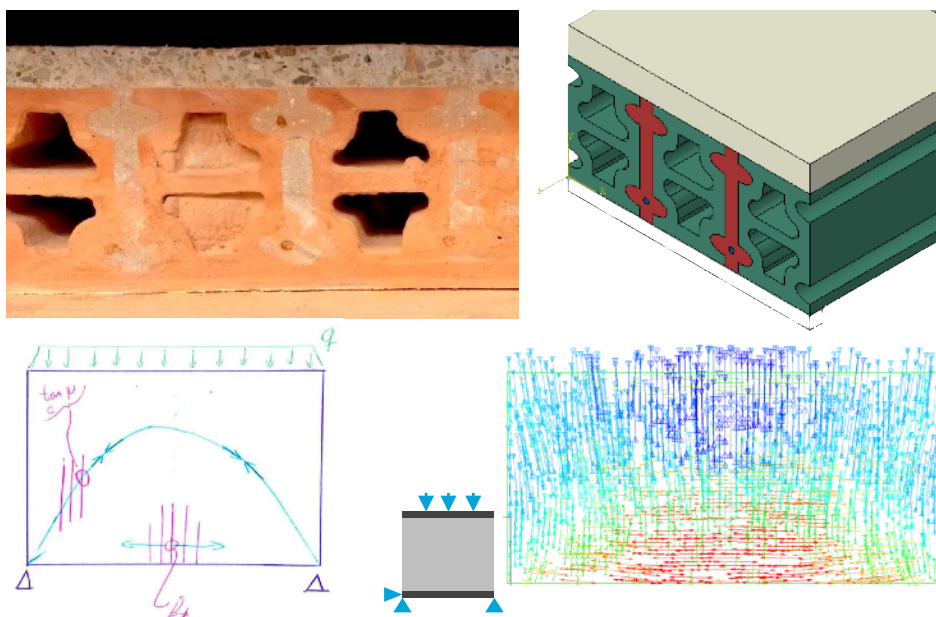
Top: a crosscut of a NeHoBo floor panel in horizontal position, left; and its 3D model, right. The bed joints (with rebar) appear vertical in between units. The panel is topped by a concrete layer. Bottom: deep beam action of a floor diaphragm (view from the top). Left, the required material properties to determine the capacity of the deep beam.
